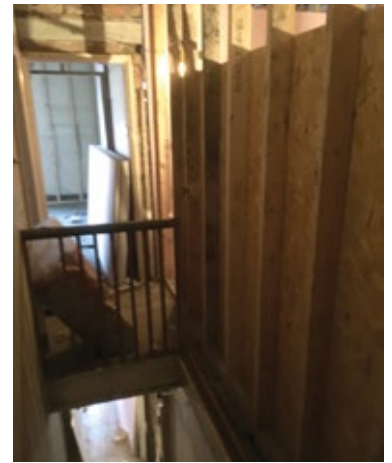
Central access staircase showing new firewall constructed around old brick remnant from the ground floor all the way up to the roof.
